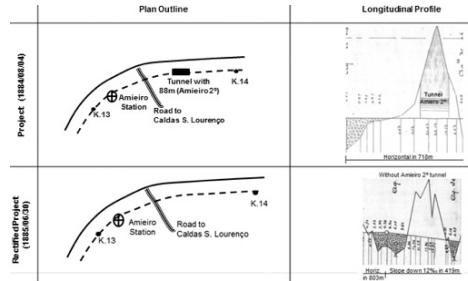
Plan outline and longitudinal profile for railway between Foz Tua and Mirandela in Paradela site for the project and rectified project (adapted REFER archives)
